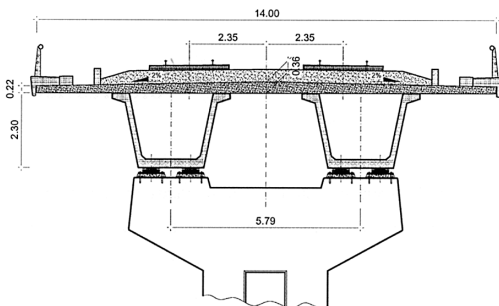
Railway bridge deck constructed with two precast "U" beams.
